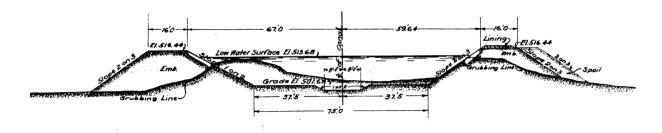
Typical Canal Embankment Section – 60 Mile Pool
